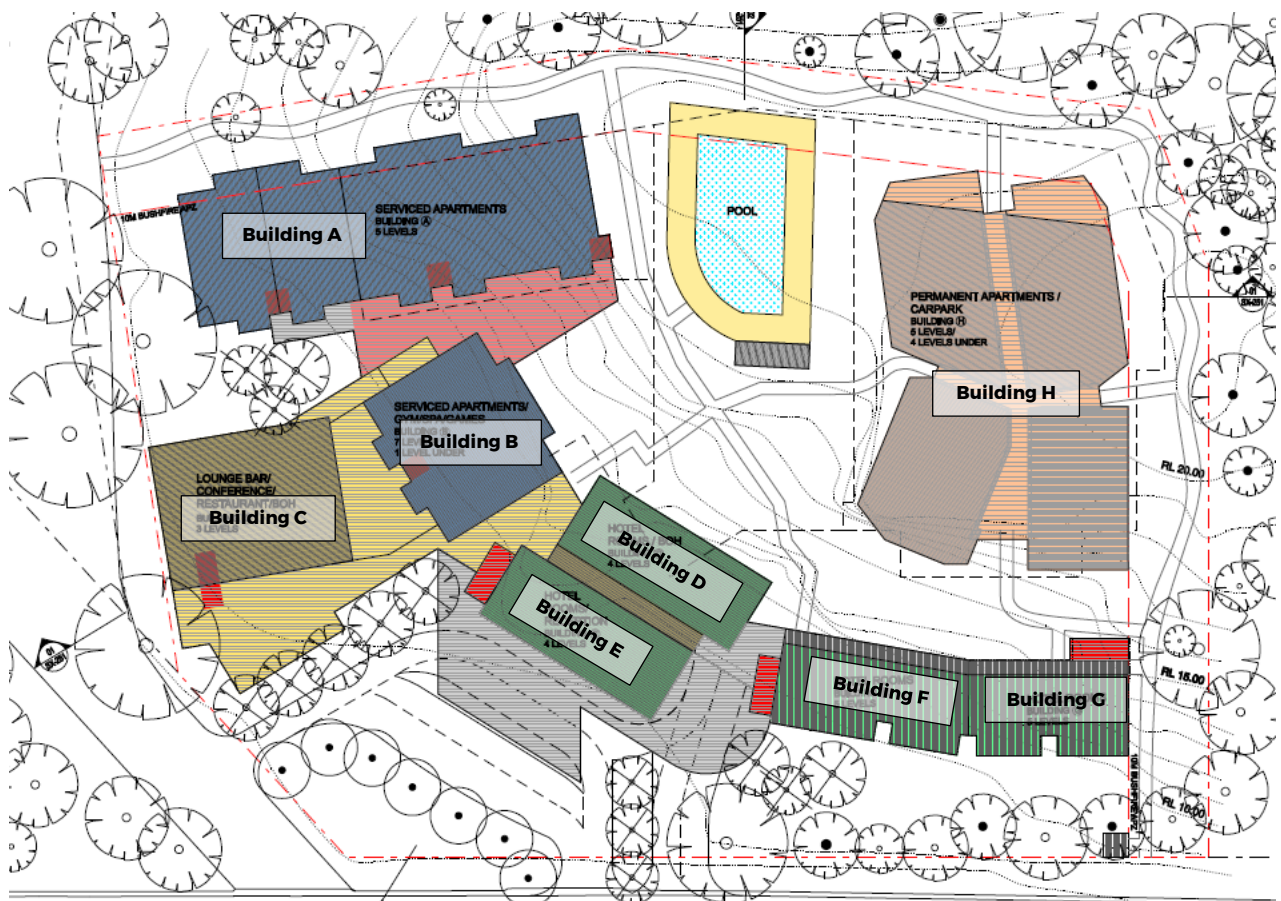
Approved Roof Plan of Concept Plan No. MP06_0183
